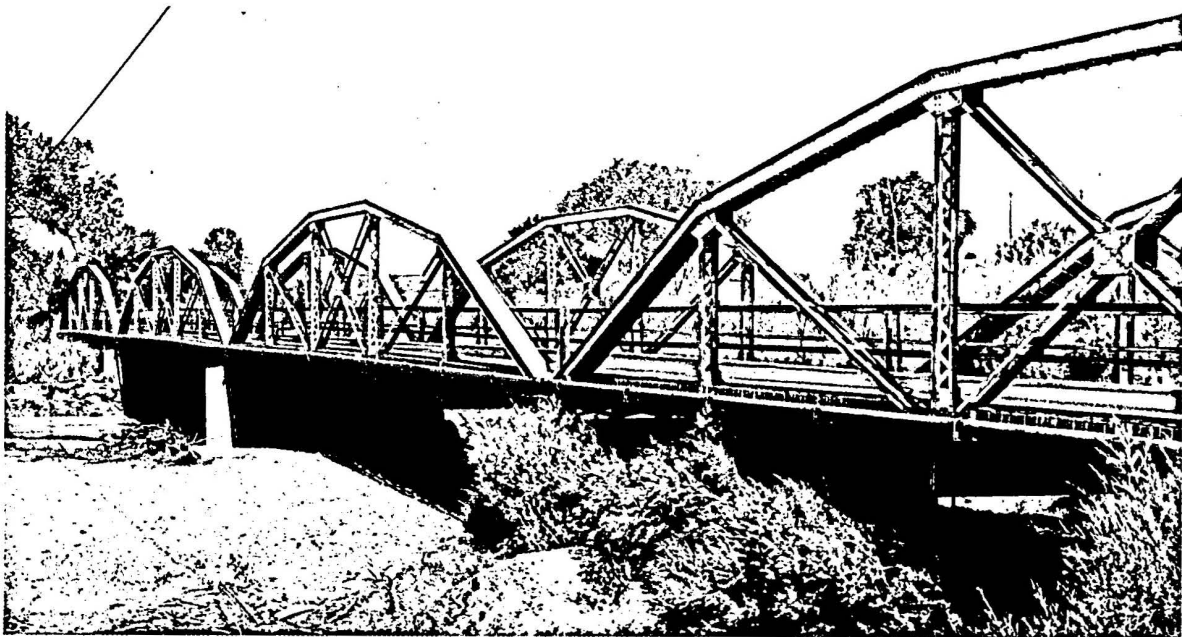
Rio Grande Bridge at San Juan Pueblo (No. 1578)
